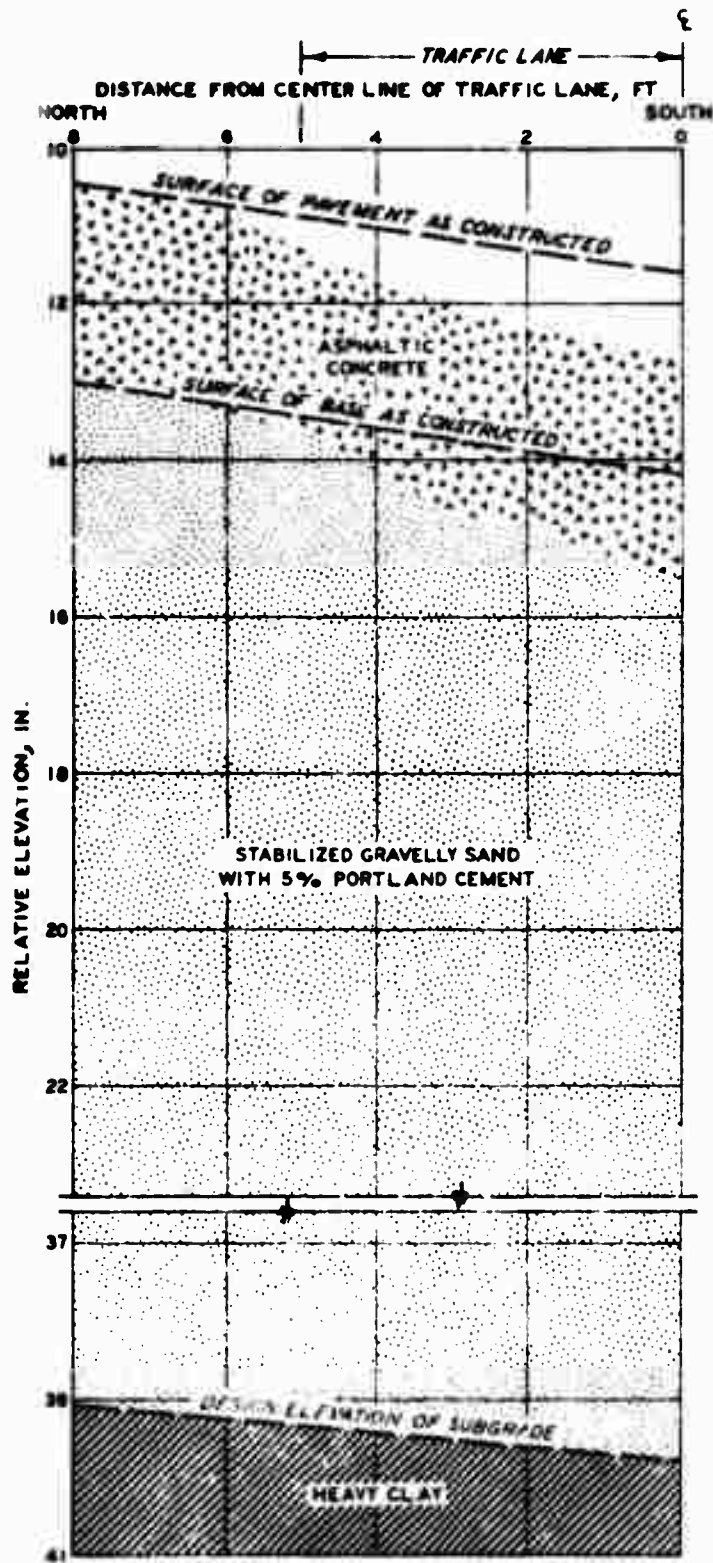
Test pit profile of item 3, lane 1, flexible pavement test section. Station 1+04 after 7820 coverages of 200-kip twin-tandem assembly
